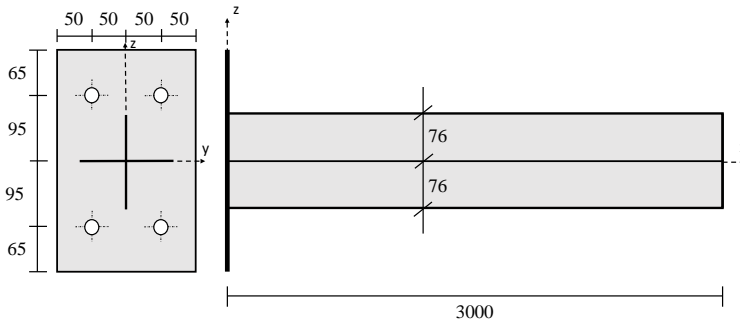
Cantilever beam and end-plate dimensions [mm].
